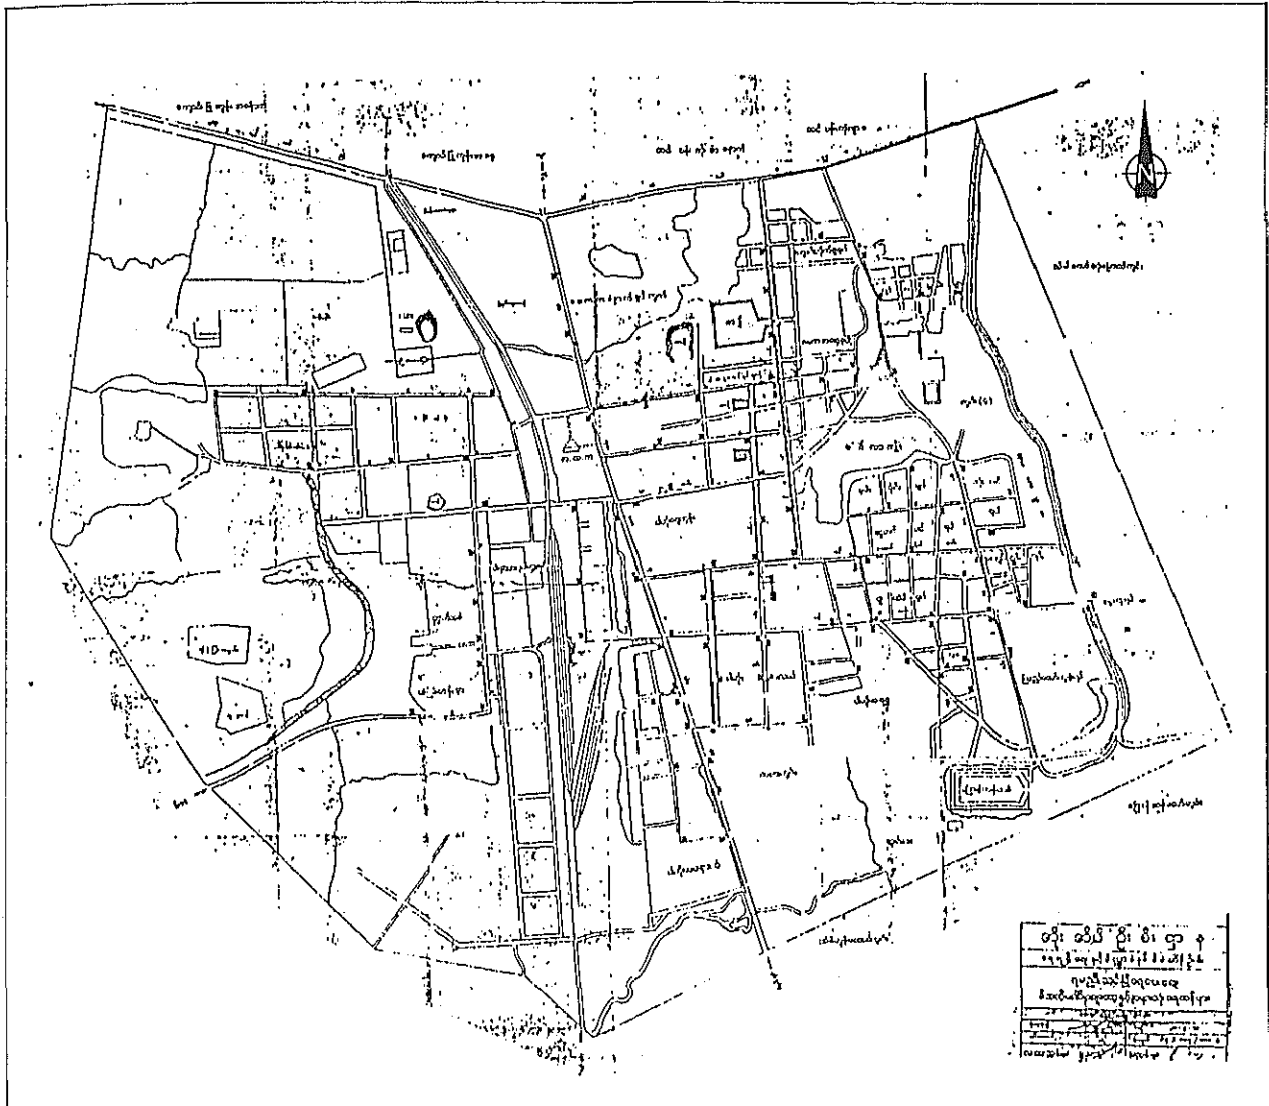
Plan View of Existing Distribution Pipes
